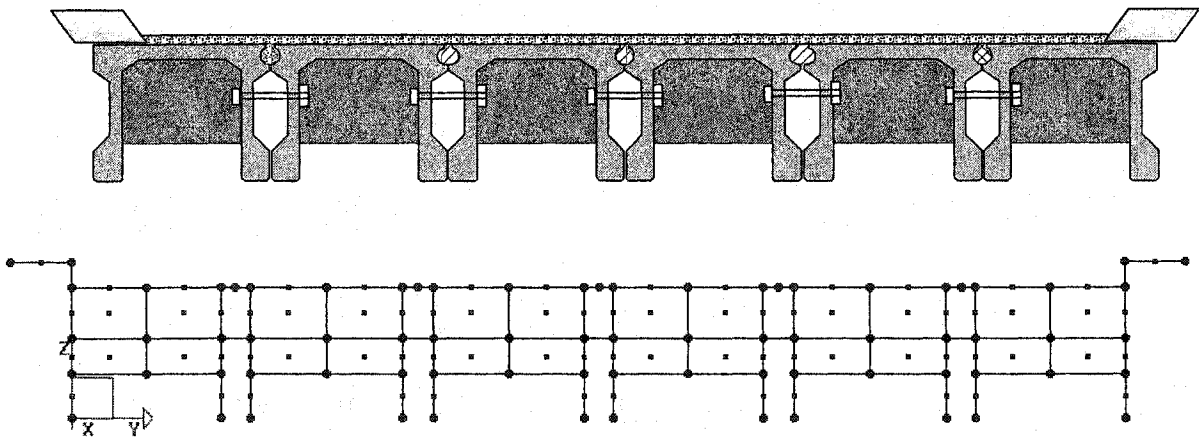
Finite element model of the whole bridge, cross sectional view
